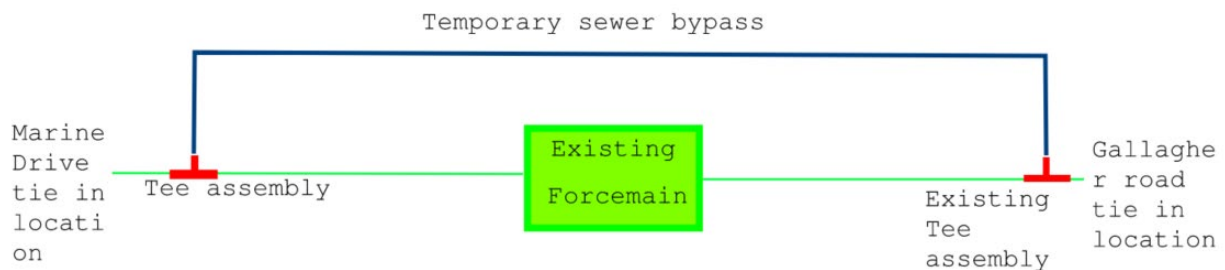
Sanitary Flow Routed Through Temporary Bypass Piping during Construction of New GS
